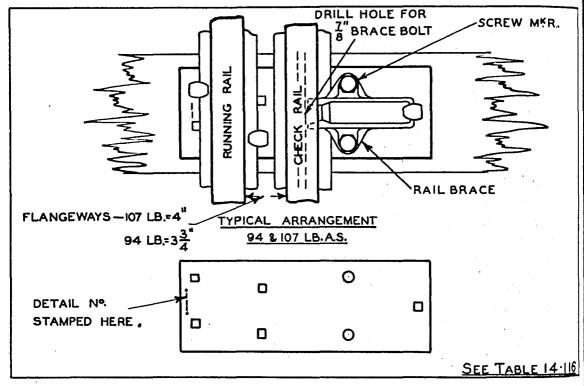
CHECK RAIL GAUGE PLATE. 062.AND 063. SERIES.
